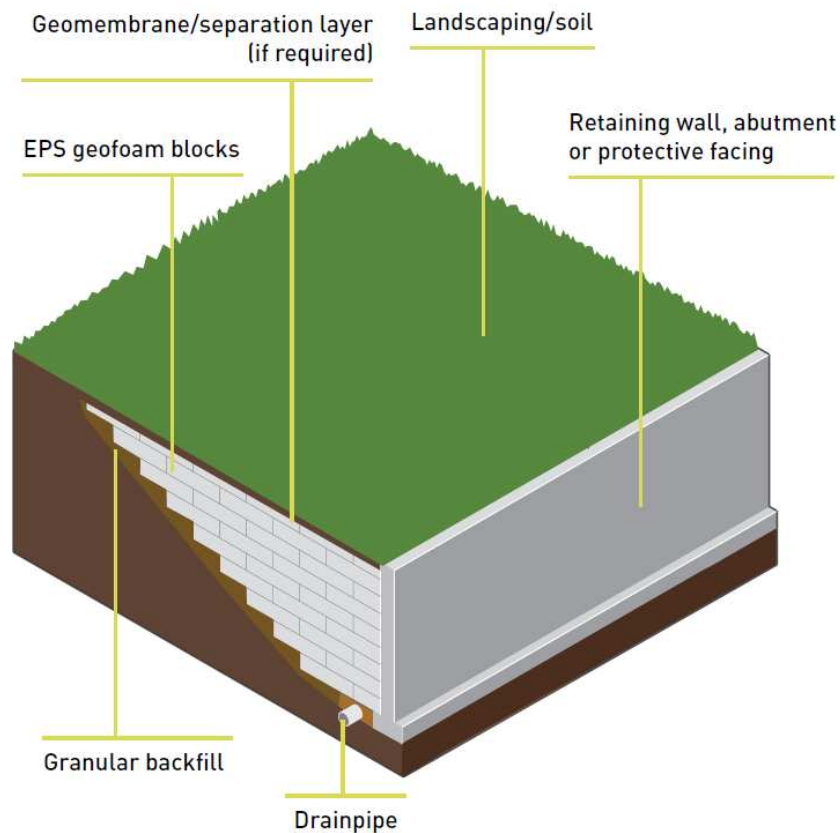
Schematic drawing of retaining wall with EPS geofoam backfill
